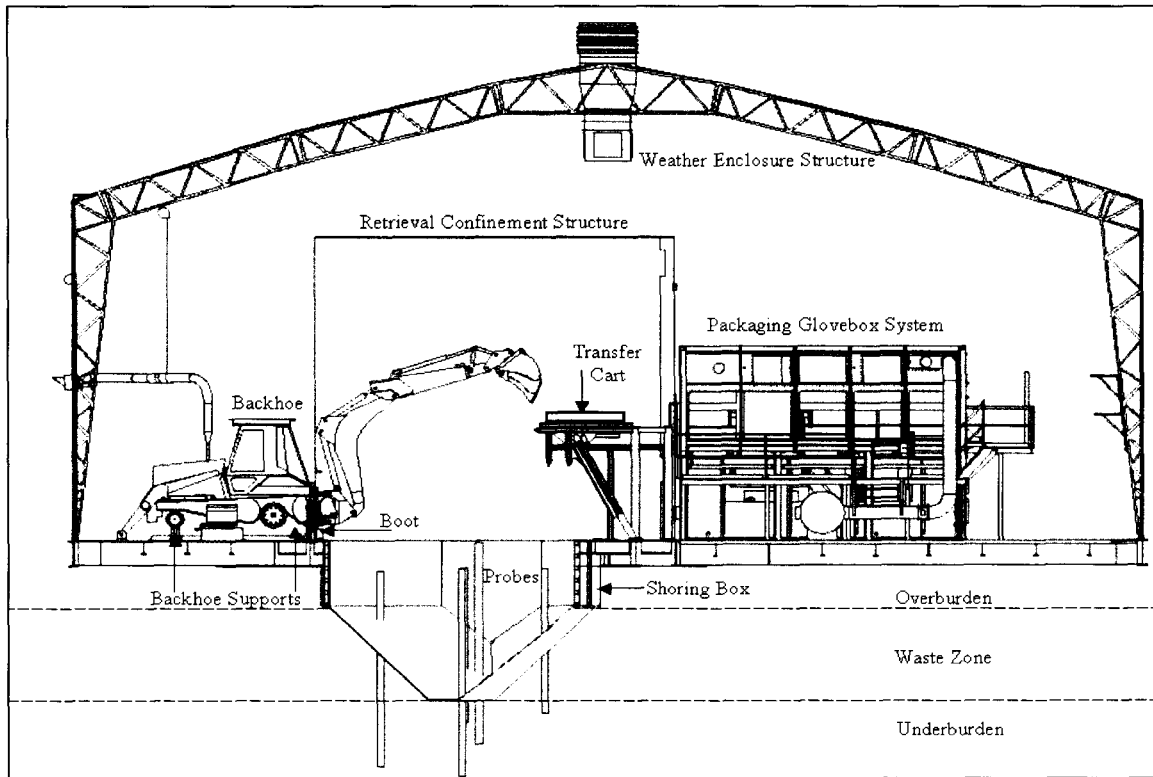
Cross section of the Glovebox Excavator Method Project facility.
